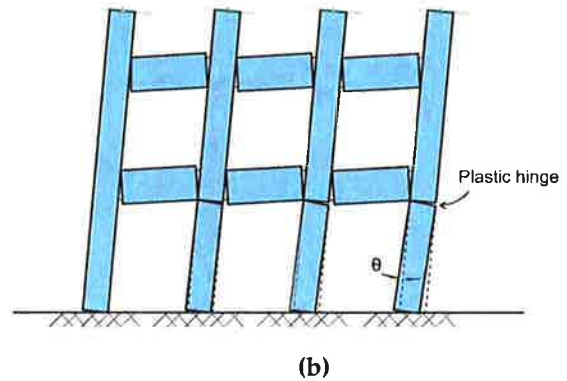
(b) Damage to column caused by frame elongation (Pampanin, 2010).
